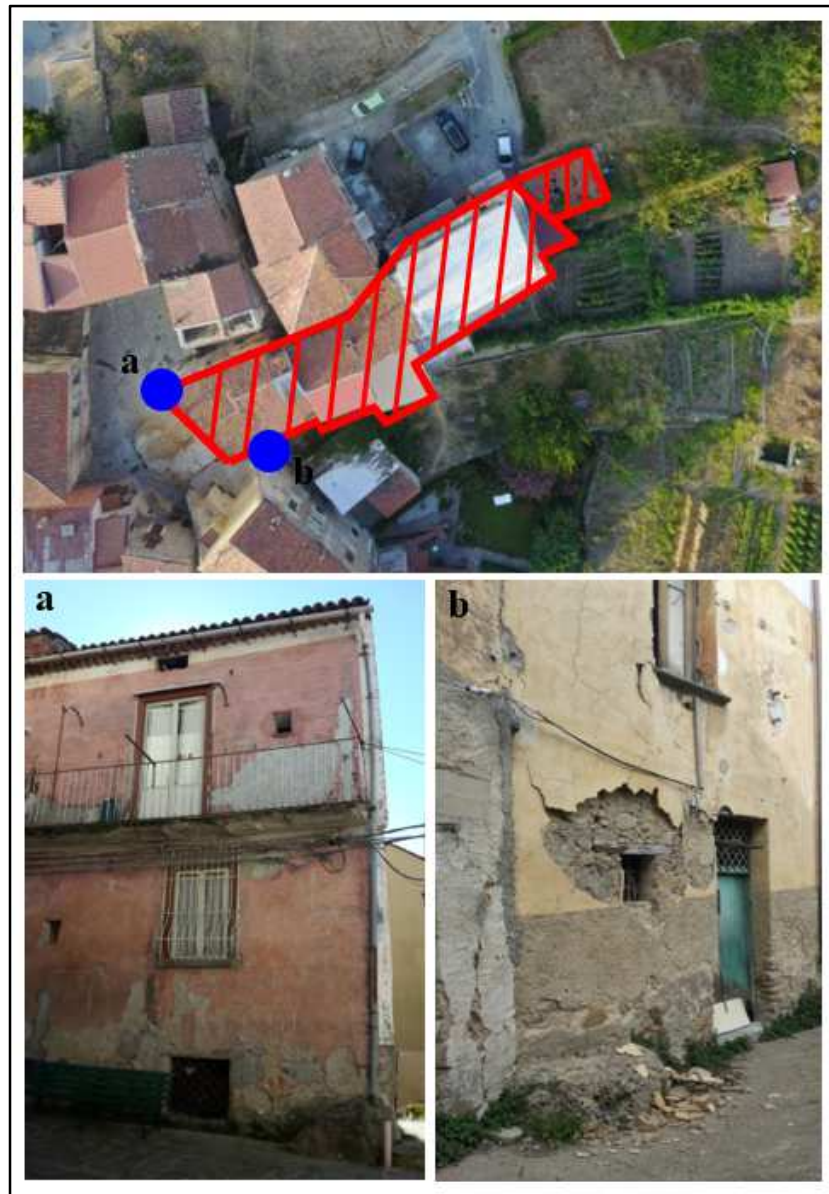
Arenaceous and conglomeratic blocks outcrops on which building has been founded.
